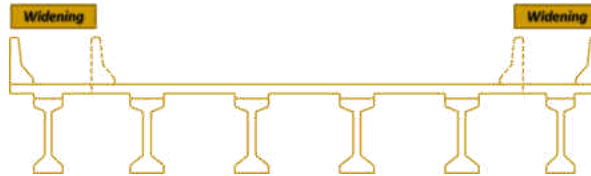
Option II – Ext. Bridge Widening Exp. (Inside and Outside Widening)
